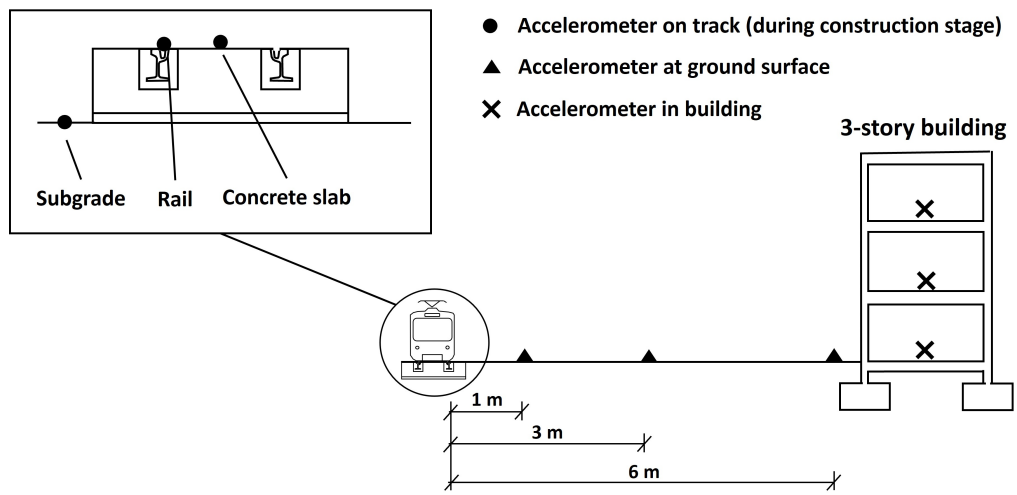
Field instrumentation plan showing accelerometers setups on track, ground and building.
